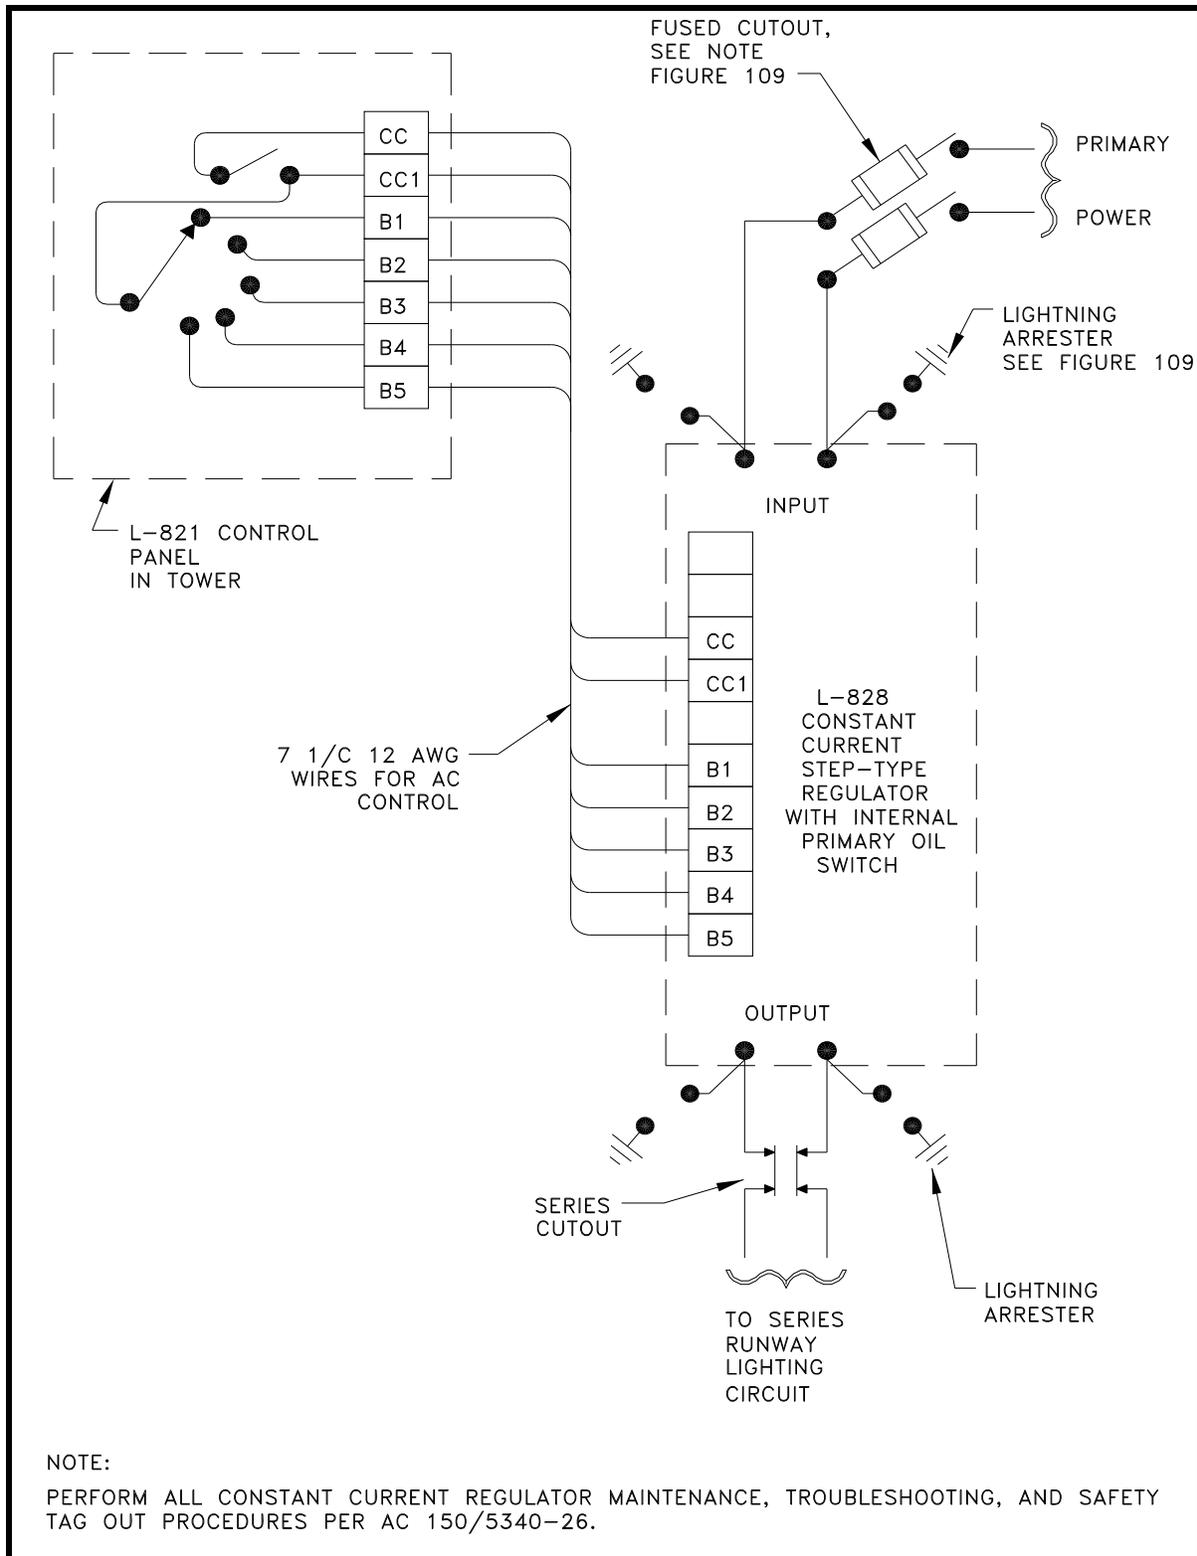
Typical Wiring Diagram Utilizing L-828 Step-type Regulator with Internal Control Power and Primary Oil Switch.
